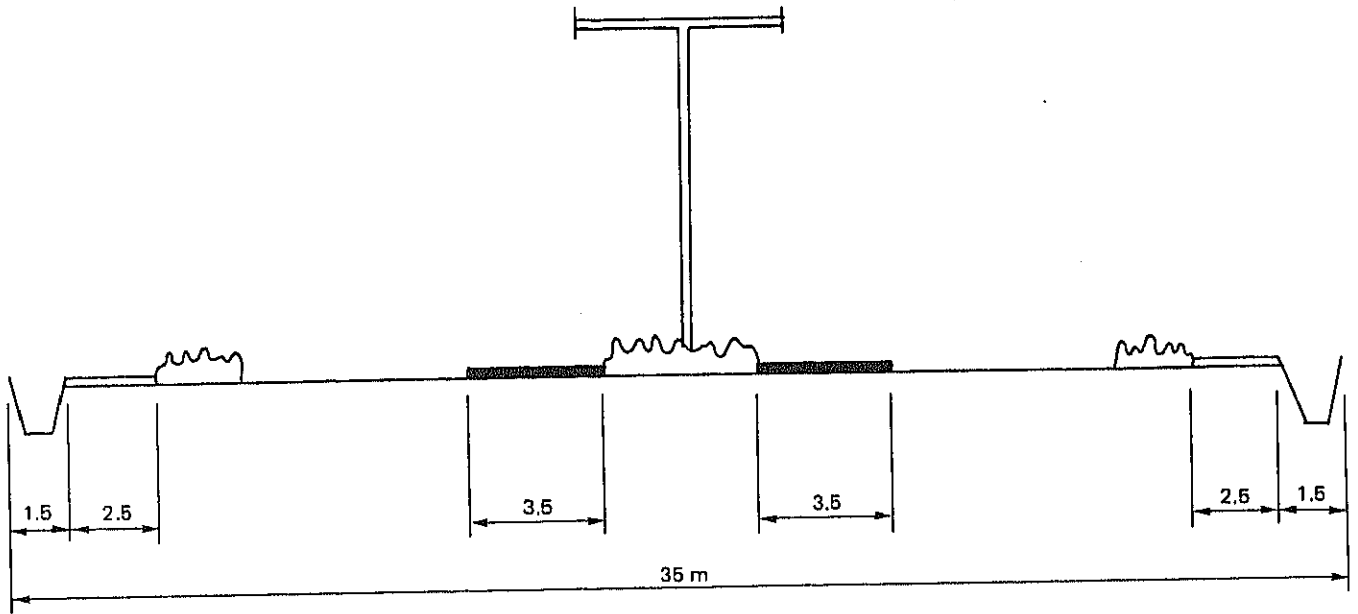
Temporary Trunk Road Section (Urgent Plan)
